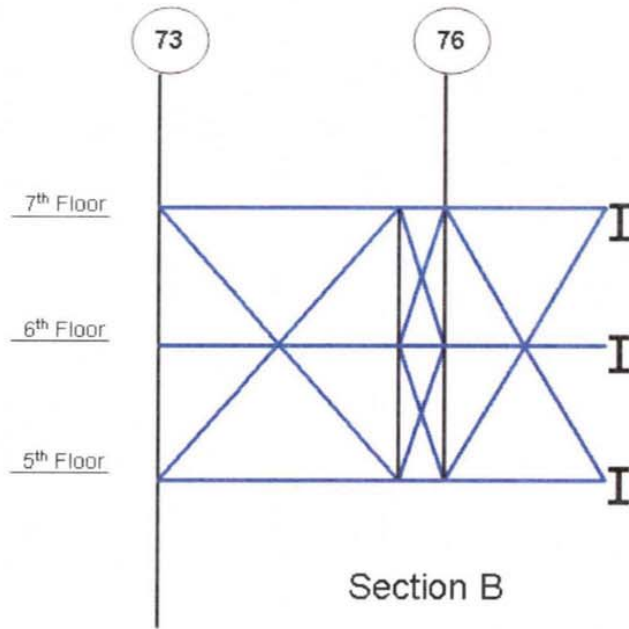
Elevation of proposed truss1 (Section B) as seen in Figure 5.16
